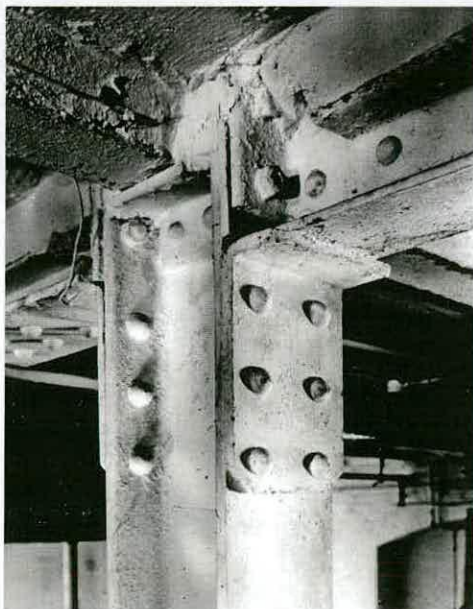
Stanchion, beam and rolled-steel joist connection (EH, BB99/09026).
